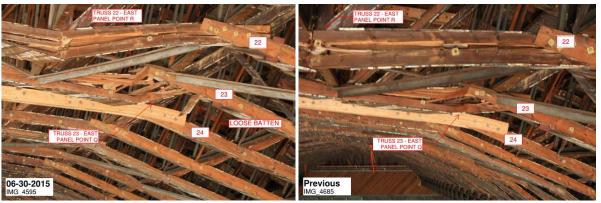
Truss damage progression at Trusses 22 and 23 East near Panel Points R and O.
